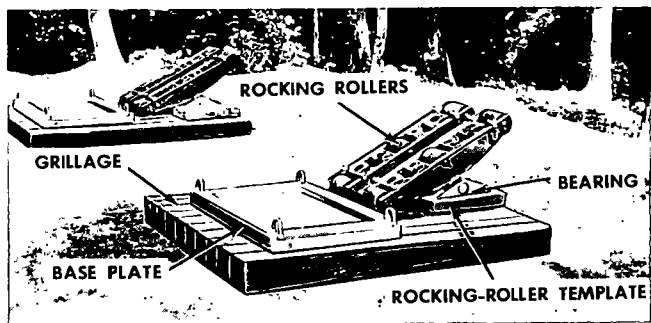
Base plate and racking rollers in position on grilloge before launching bridge.
